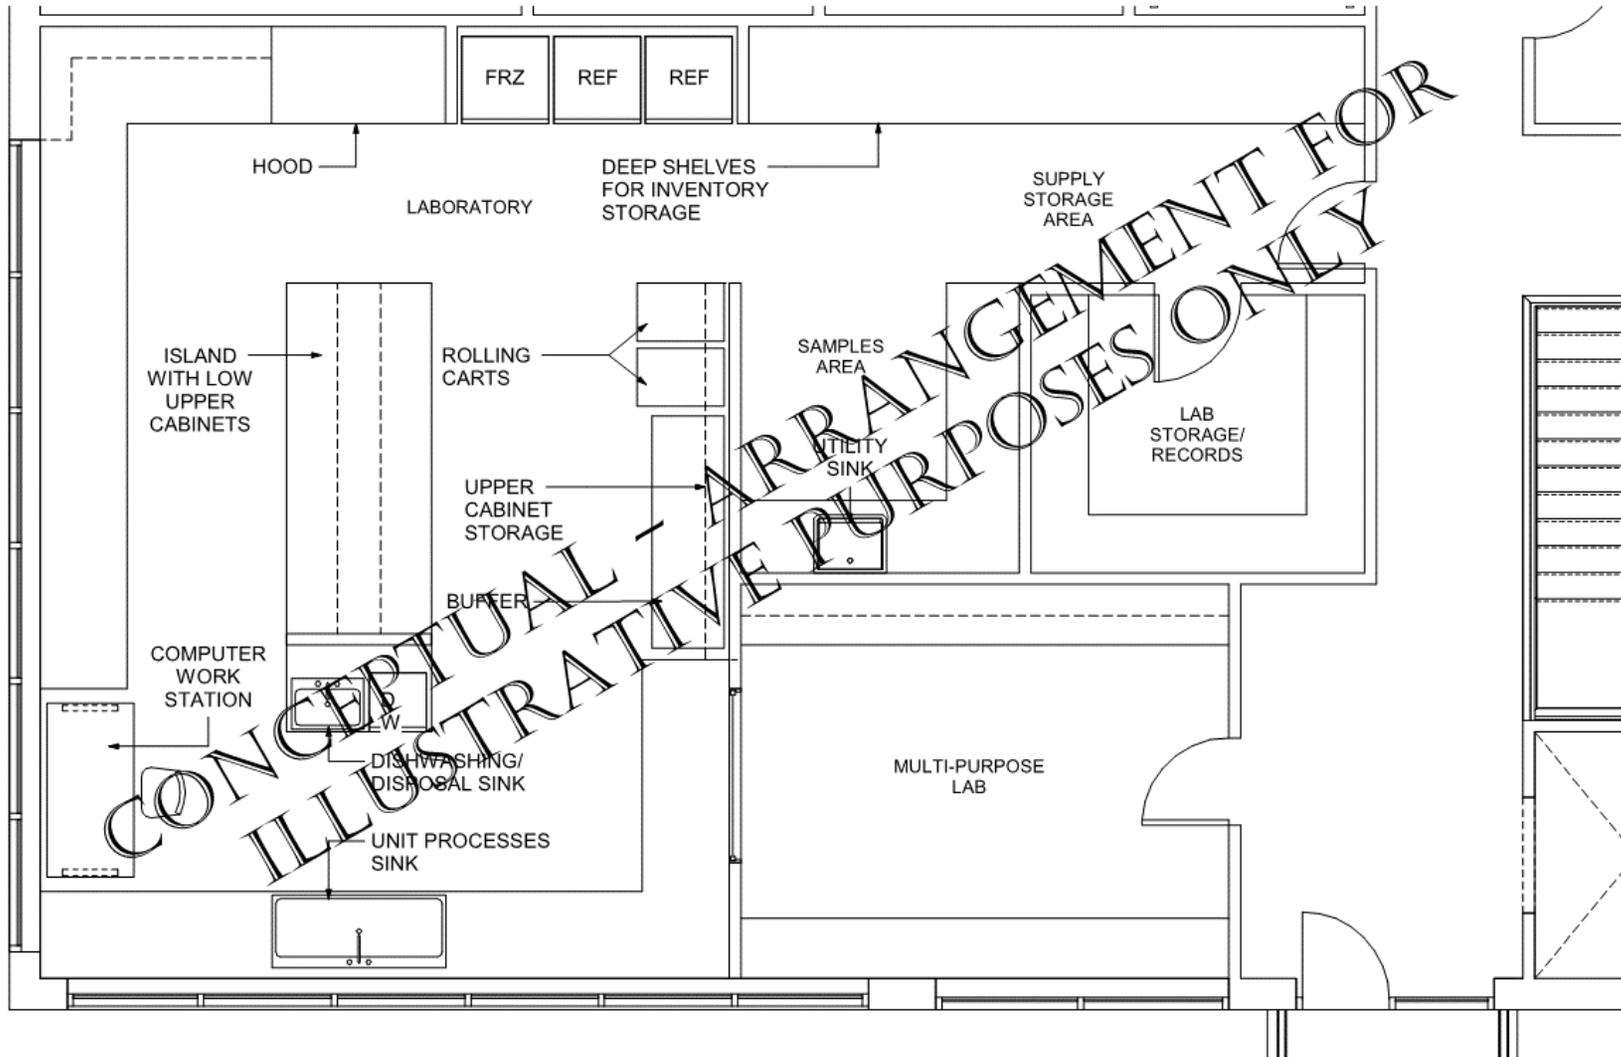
Potential concept for laboratory floor plan within Administration Building
